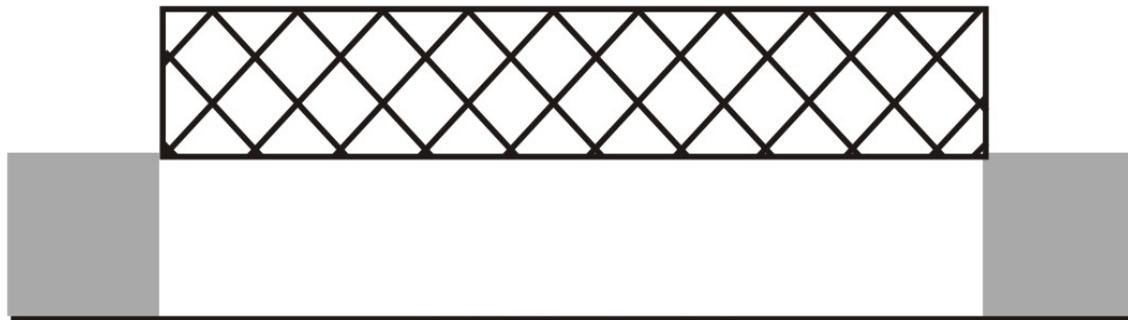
Cornish-Windsor Covered Bridge (1866), spanning Connecticut River, Bridge Street, between, Cornish, New Hampshire and Windsor, Vermont. This National Civil Engineering Landmark bridge is an example of the Town lattice truss.
